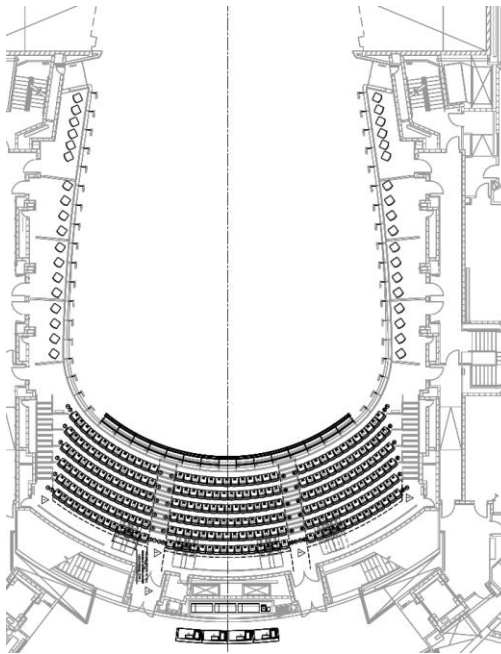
Upper Dress Circle Seating Floor Plan
